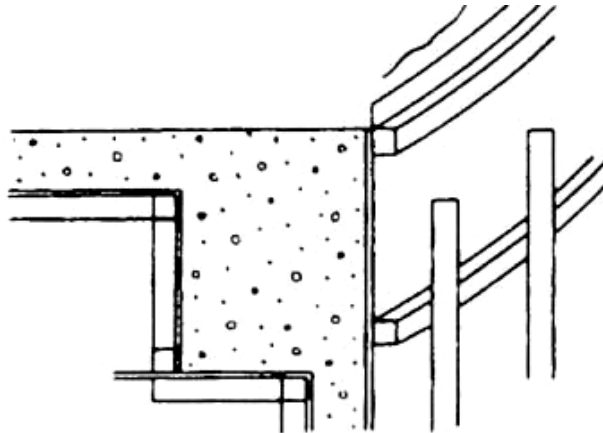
Sketch of cracking due to bowing of formwork
